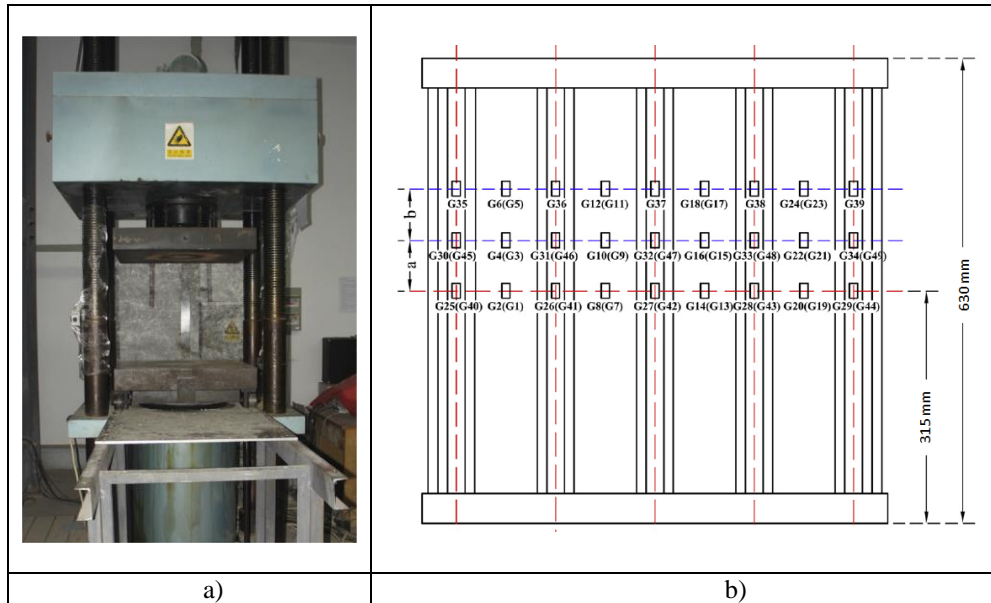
(a) Hydraulic compression test machine, (b) Locations of the strain gauges. [37]
